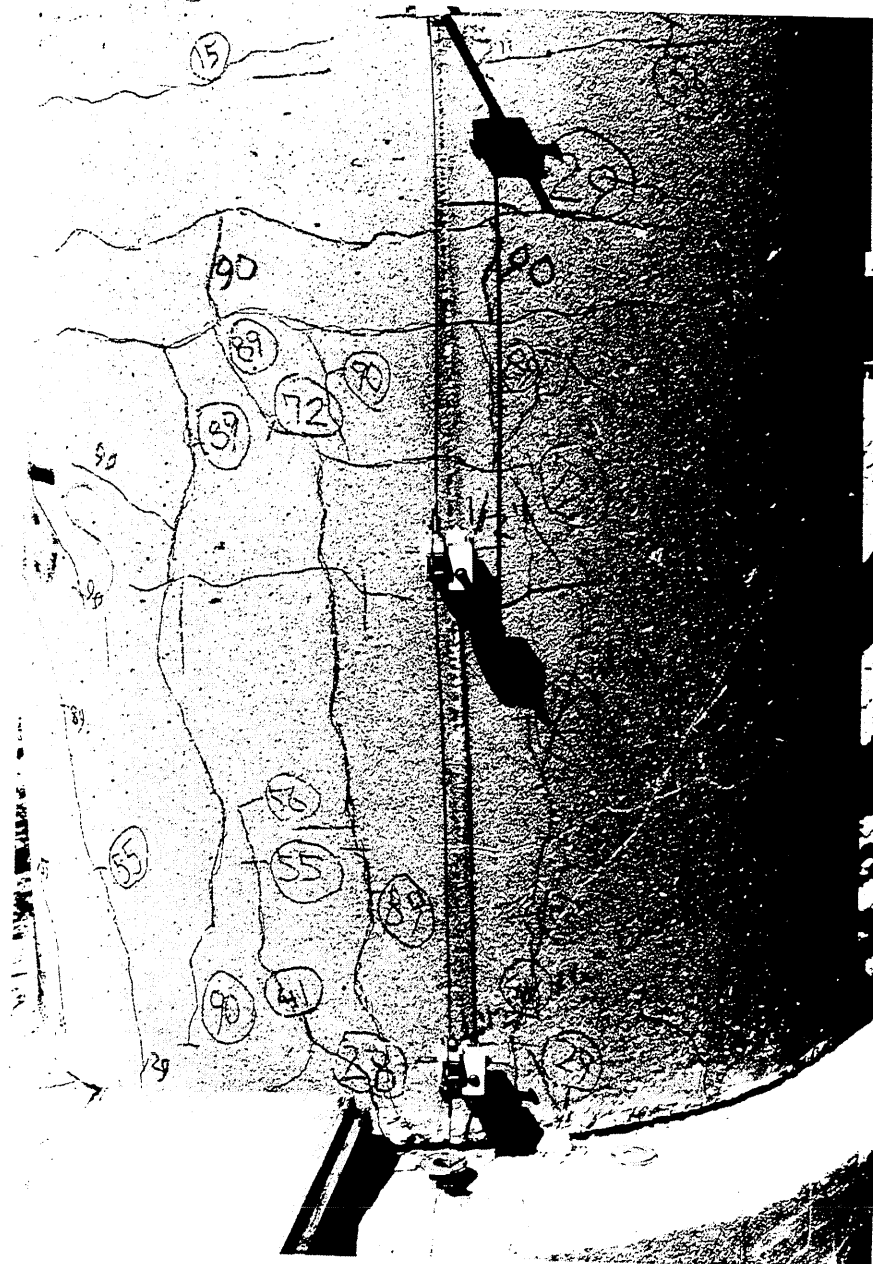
As-Built Column C15S Damaged to Failure
